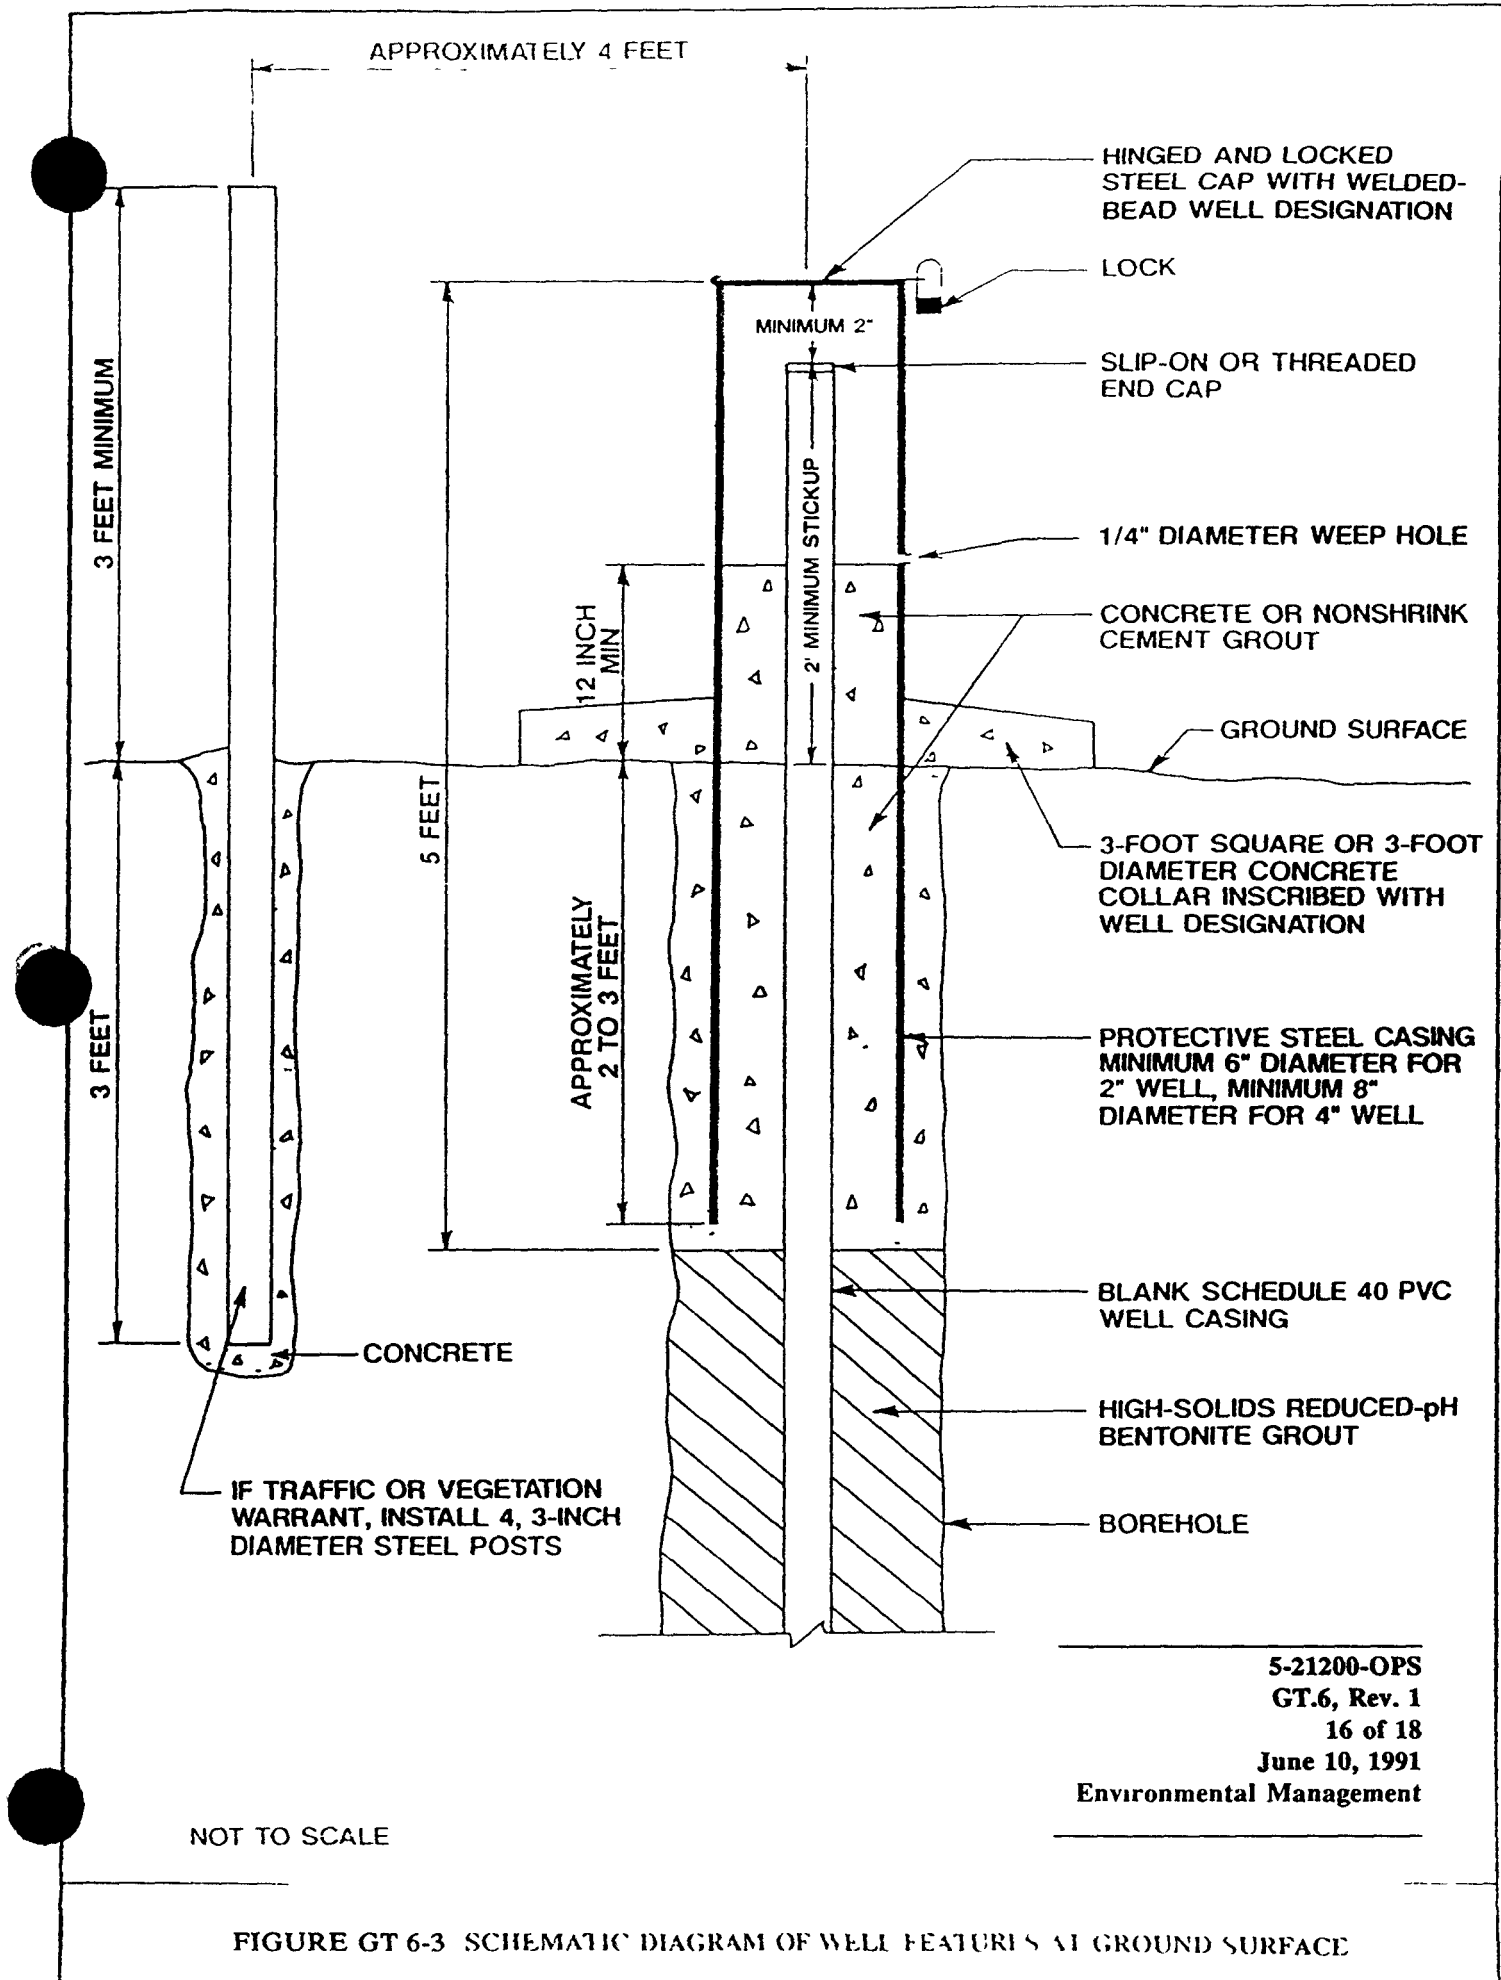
shows a schematic diagram of well features at the ground surface. A 5-foot-long protective steel casing with a hinged and locking steel cap will be installed over the monitoring well riser that projects above the ground surface between 24 and 48 hours after initial grout placement. The protective casing will have a minimum 8-inch I D for 4-inch wells and a minimum 6-inch I D for 2-inch wells. The well designation will be welded on the protective casing.
